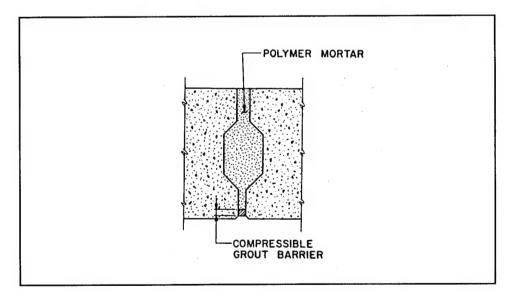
Detail of female shear key, Fremont Street Bridge (from Smyers 1984)
